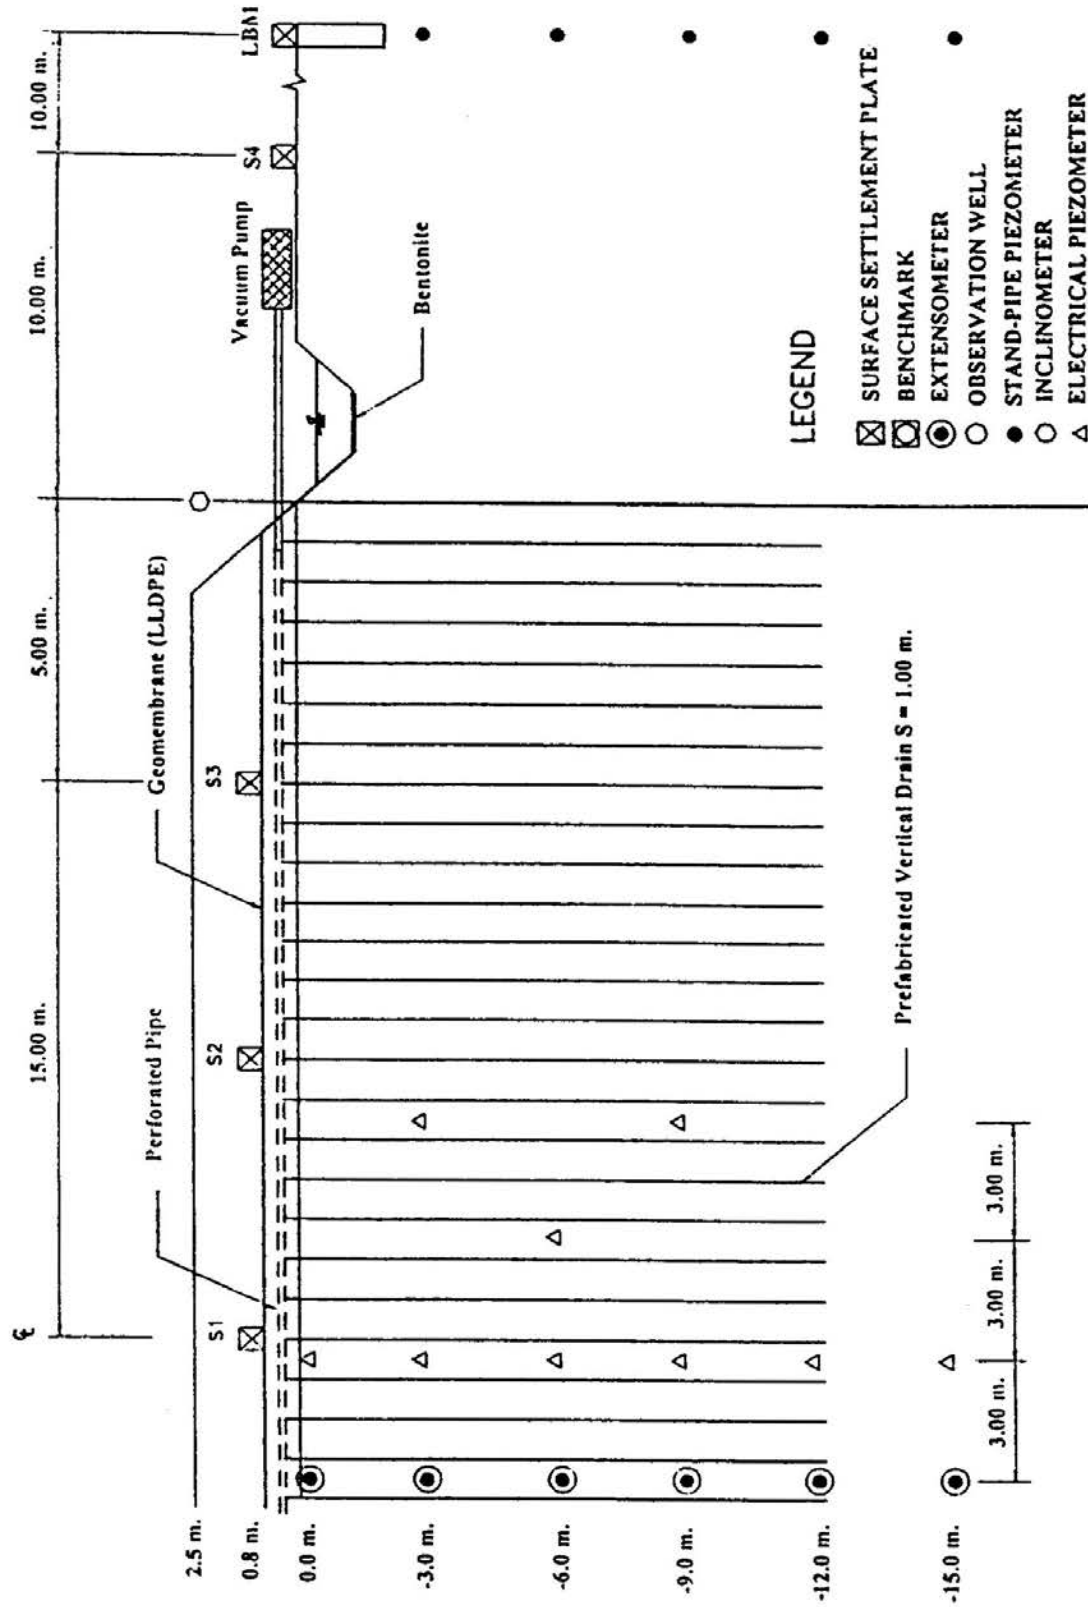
Cross-Section of Embankment 2 with 12.0 m Long PVD and Location of Monitoring Instrumentations
